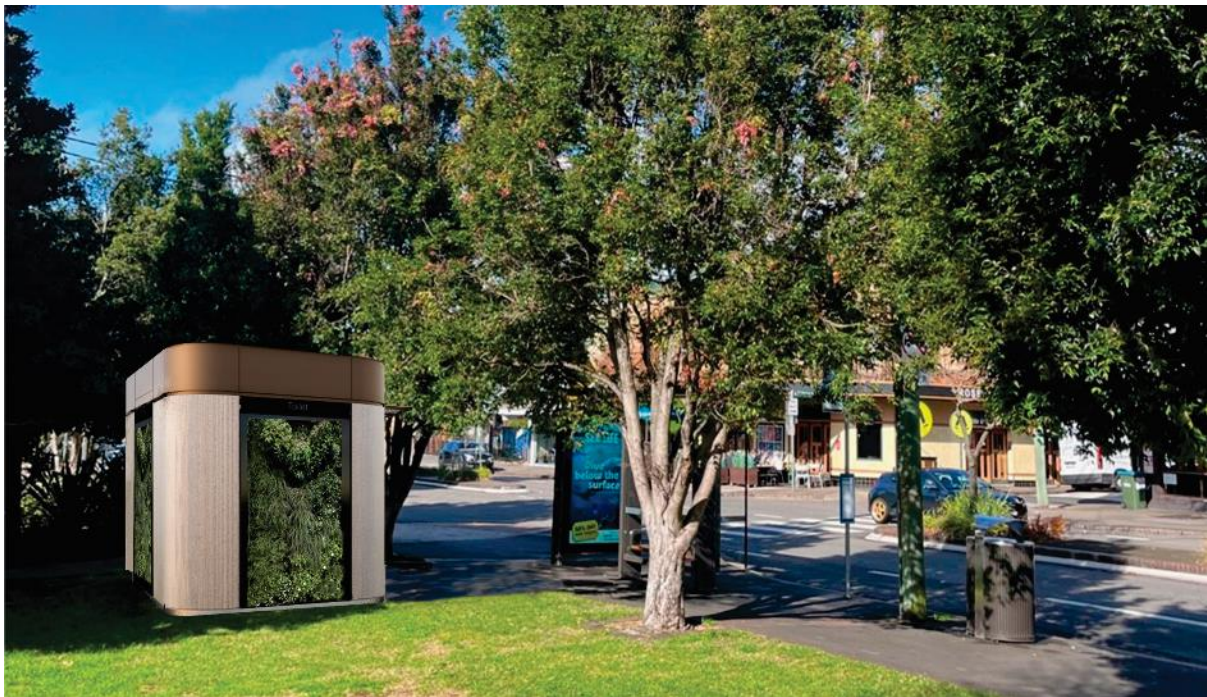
Photomontage of proposed APT viewed from rear of the Ellen Lawman Rest Area looking southeast
